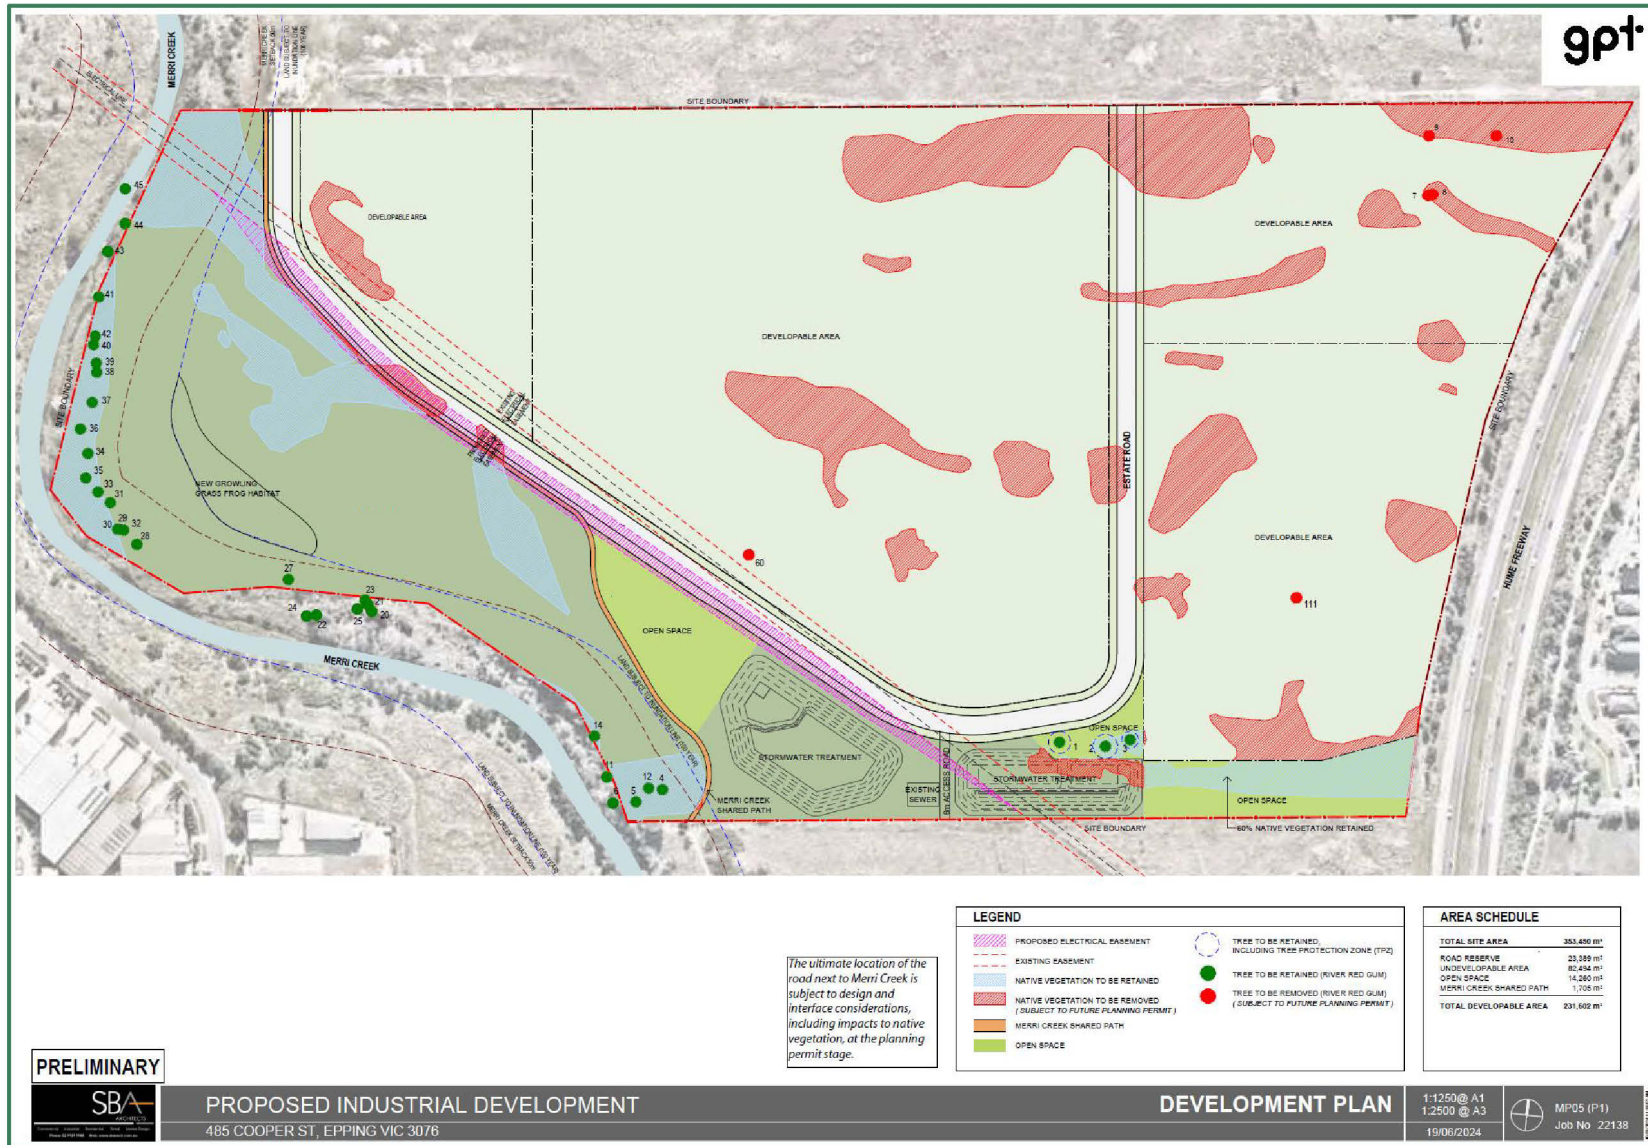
DEVELOPMENT PLAN LAYOUT INCLUDING INDICATIVE STAGING
